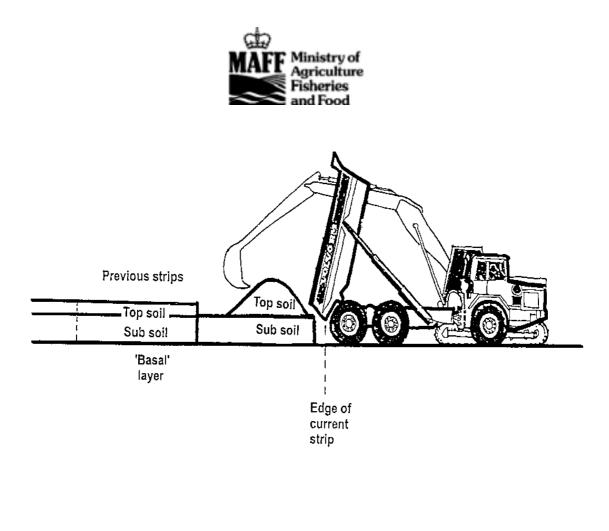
Soil replacement with excavators - dump trucks Sub soil layer
